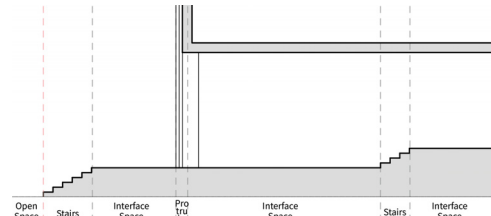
Layering, example of office 'Semteo' (west side, E section)
